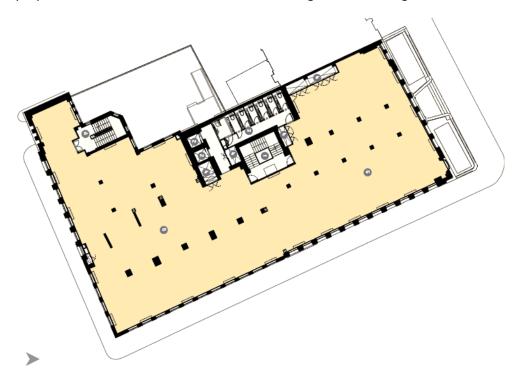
Indicative existing floor plan at first, second and third floor level.
